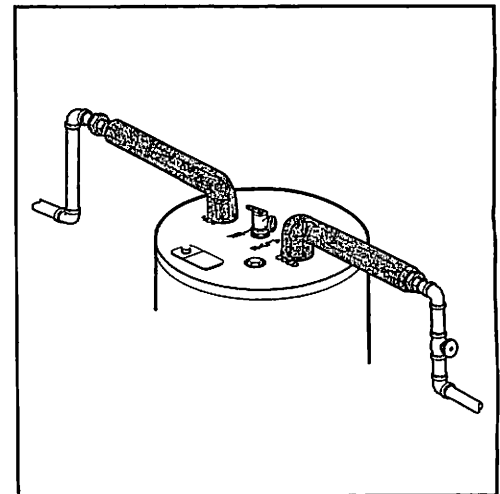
Typical Horizontal piping arrangement. (Your installation may vary slightly.)
